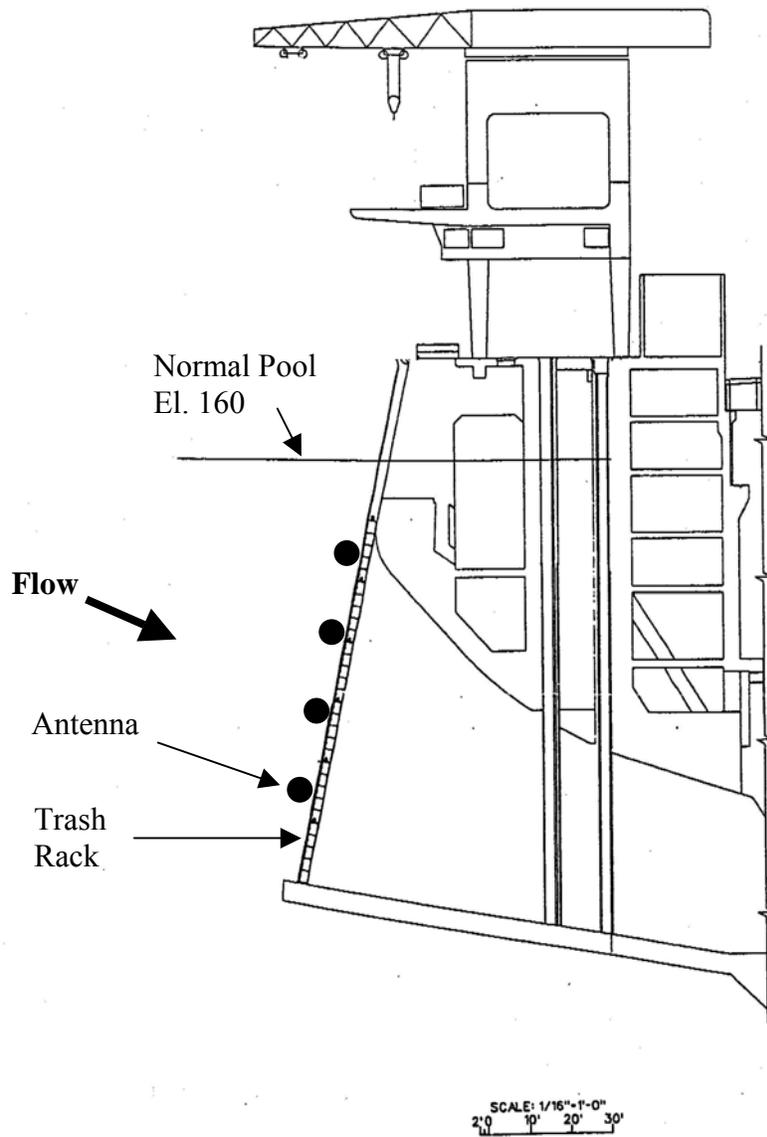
Cross section through a typical turbine intake at The Dalles Dam indicating normal pool elevation of 160 ft above mean sea level, trash racks, and underwater antenna locations at elevations of 140, 120, 100 and 80 feet above mean sea level. Modified from a U.S. Army Corps of Engineers schematic.
